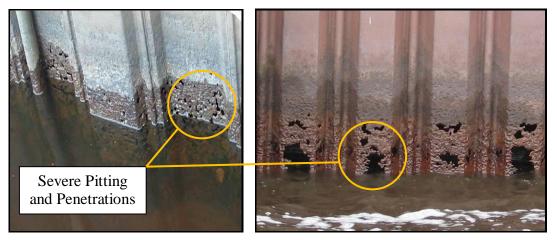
Typical Corrosion Found on DSH Sheet Pile Structures
